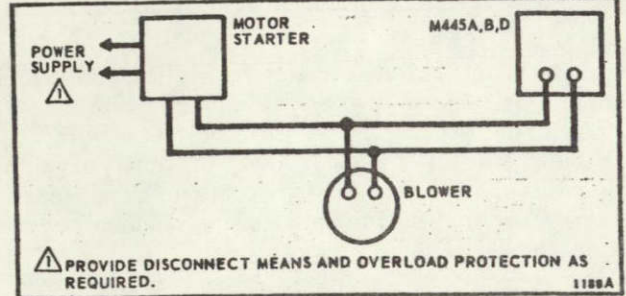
POWER CONNECTION FOR M445A,B,D MODUTROL MOTORS USED TO CONTROL AIR DAMPERS.
